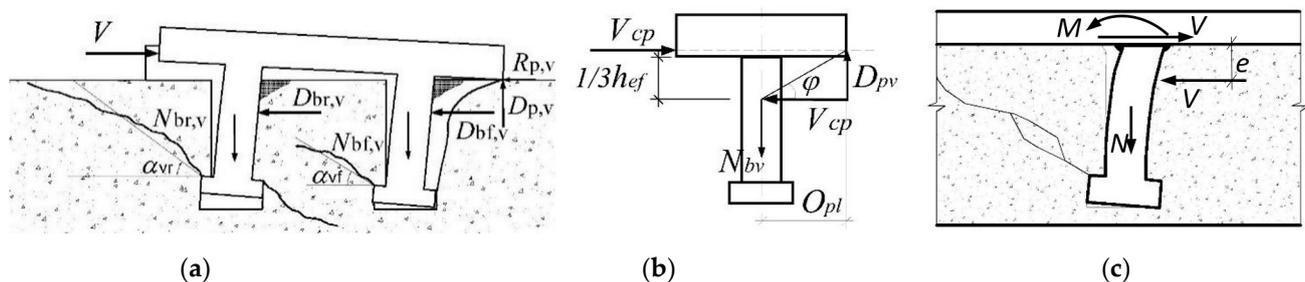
(a) Pryout failure mechanism of an anchor group [15,16] (b) Load transfer mechanism over the fastener [7] (c) Stud shear connector in a composite member [12,17].
